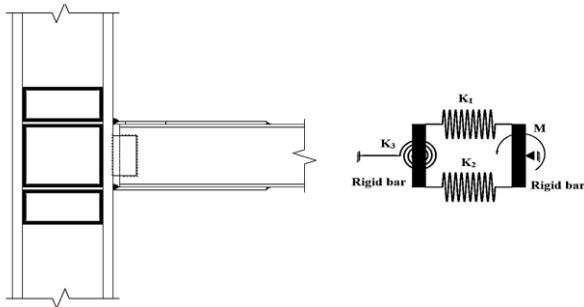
The analytical spring system model of welded flange plate connection.
